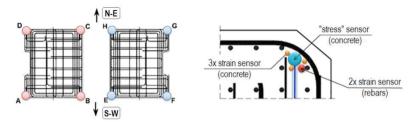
Cross section of the pylon legs just above the upper surface of the foundation slab with the sensor layout in each of the corners [6].
